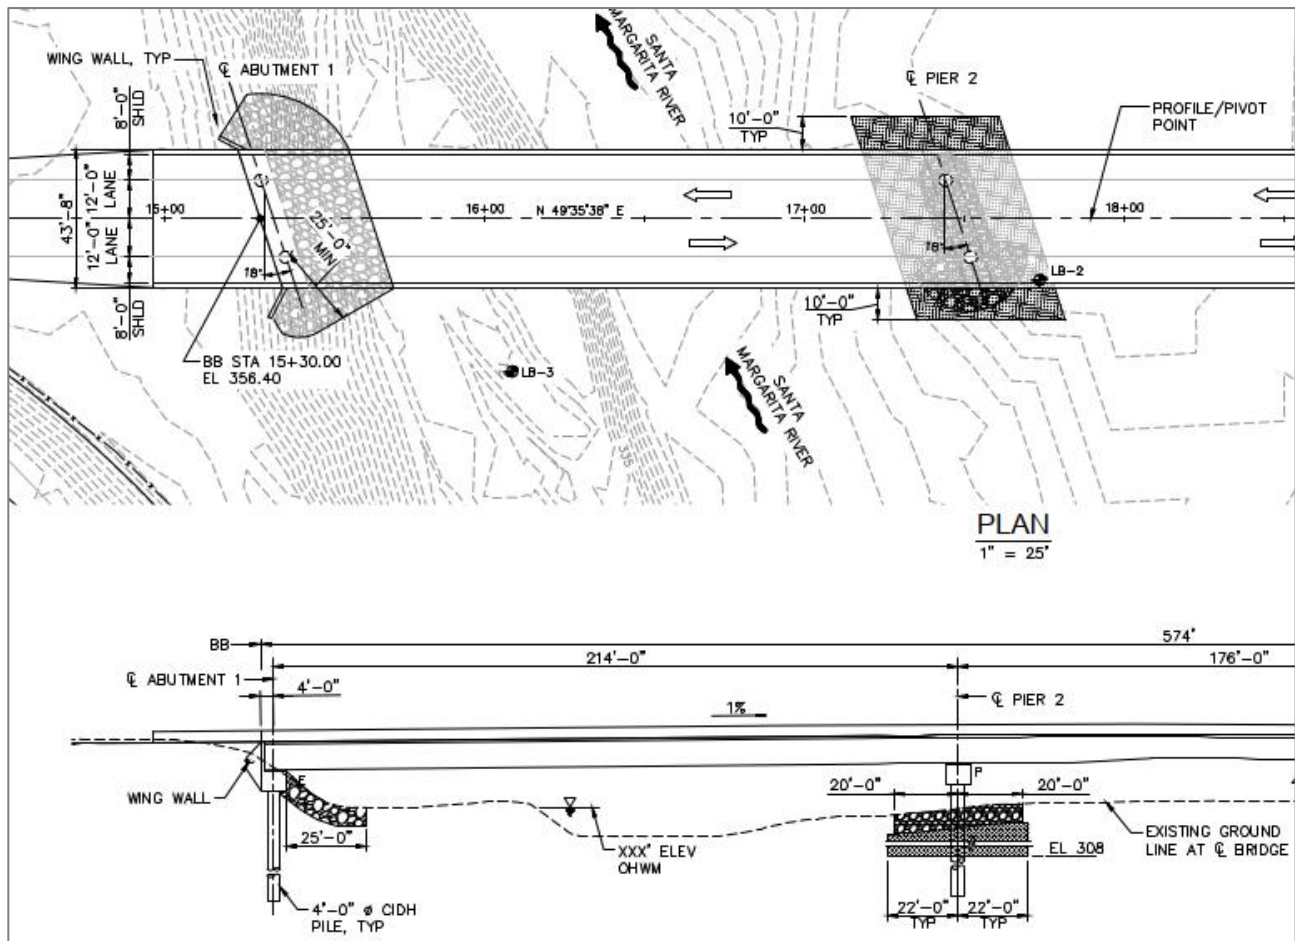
Riprap Protection at Abutment 1 Slope and Pier 2 Ground Improvements
